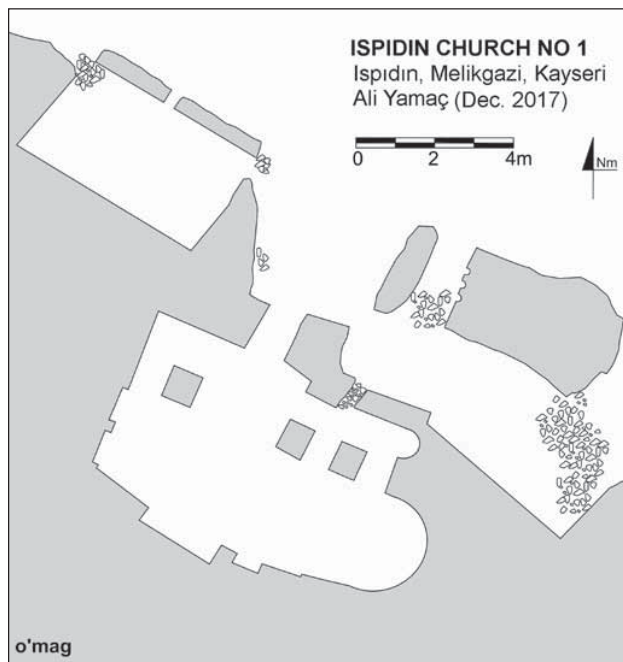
Plan of Ispidin Church No. 1 (drawn A. Yamaç).
